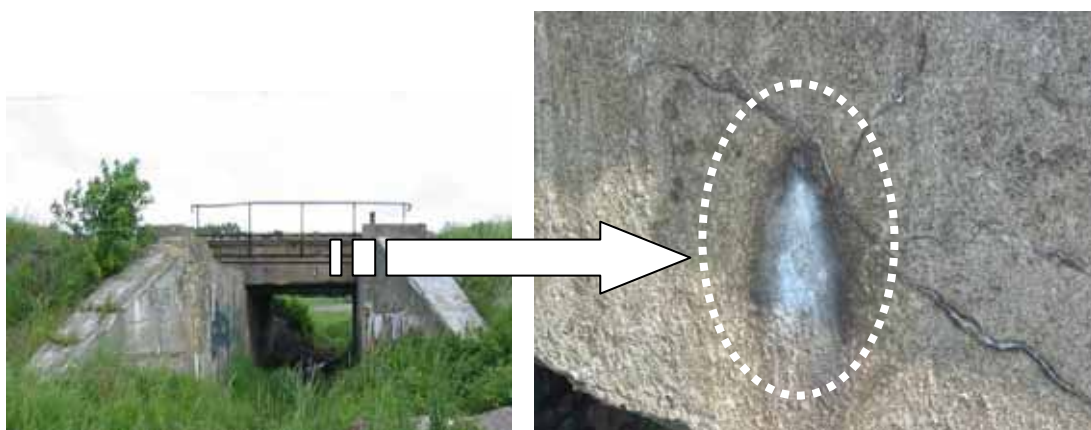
Example of concrete deterioration (permeability increase) with coexisting with contamination and discontinuity defects (photographed by the Author)
